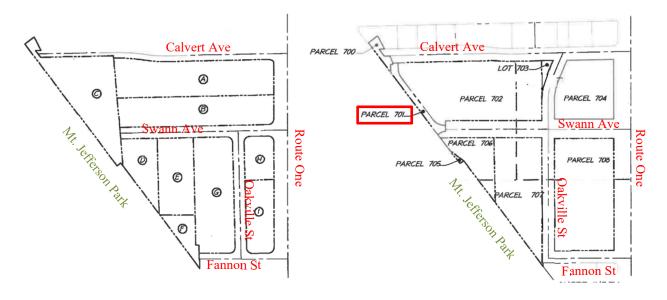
Existing conditions in Oakville Triangle, left. Approved subdivision with new parcels and street network, right. Proposed new private road seen as Parcel 701.
